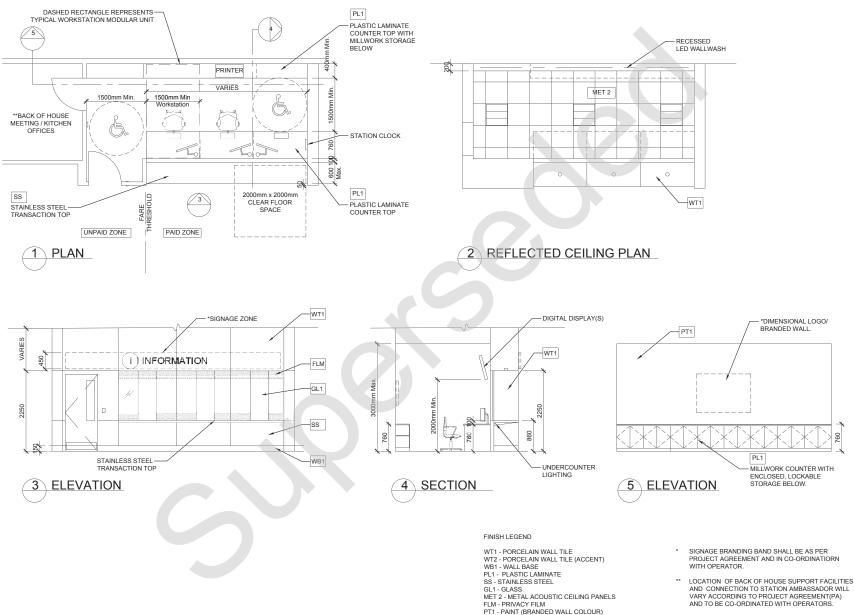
Station ambassador office: Plan, reflected ceiling plan, elevations, section
